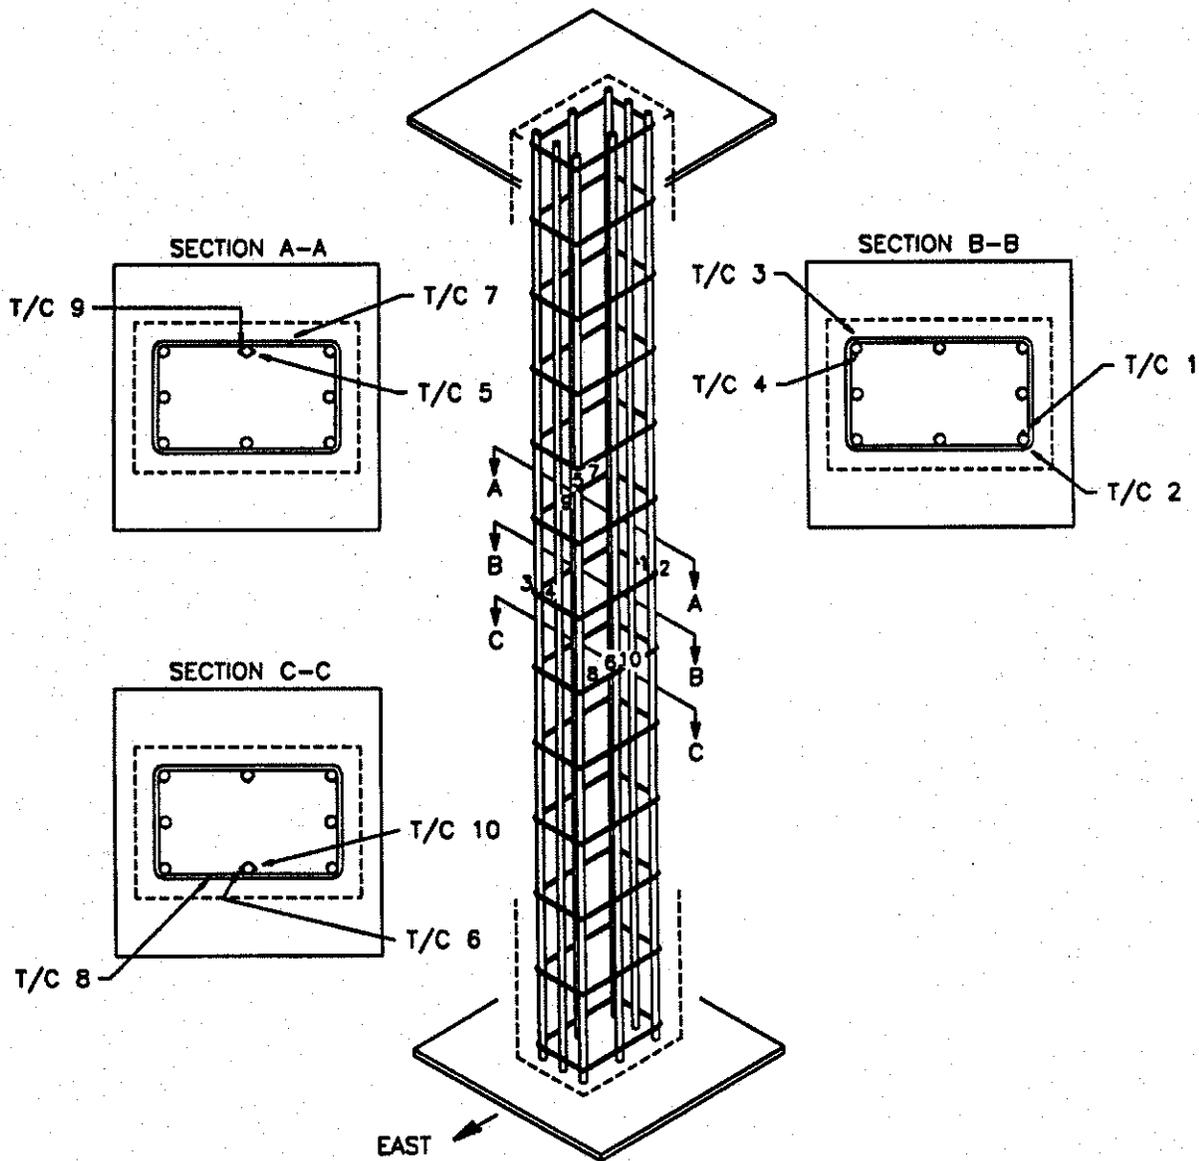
LOCATIONS OF T/C'S ON REINFORCING BARS:
